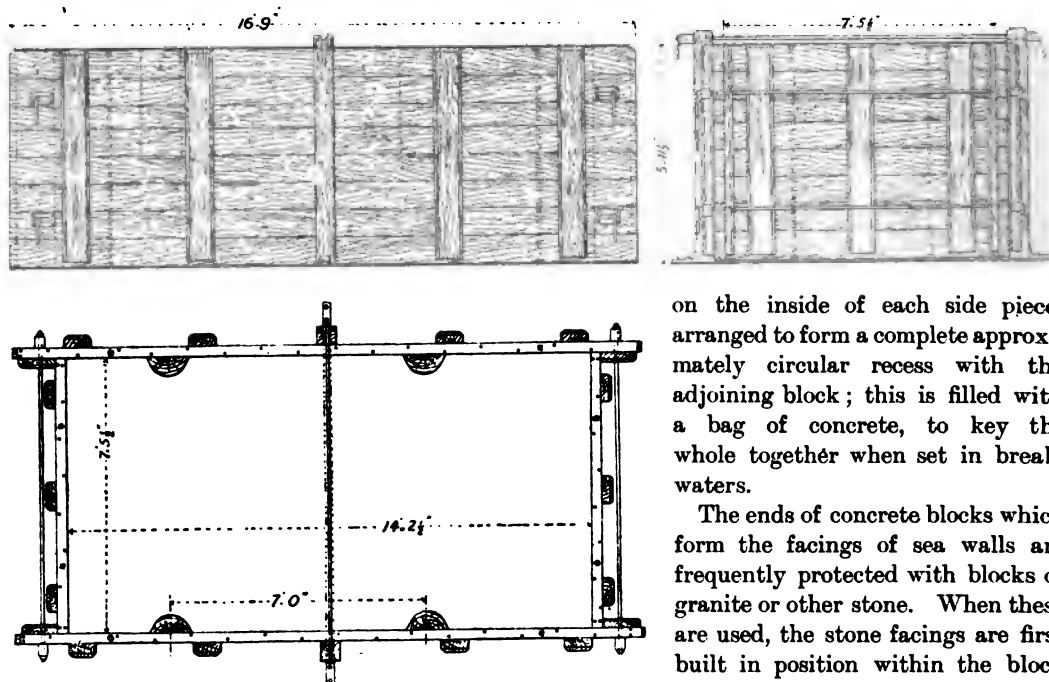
40-Ton Block Mould, Admiralty Harbour, Dover.
